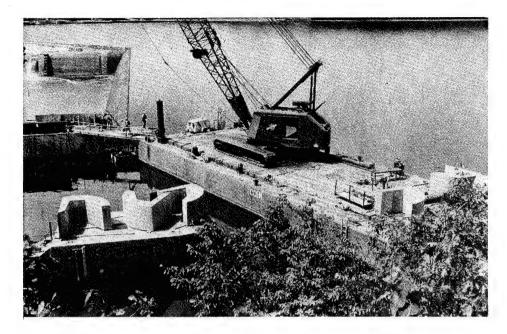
Precast pier nose sections ready for installation, Vischer Ferry Dam (from Sumner 1993)
